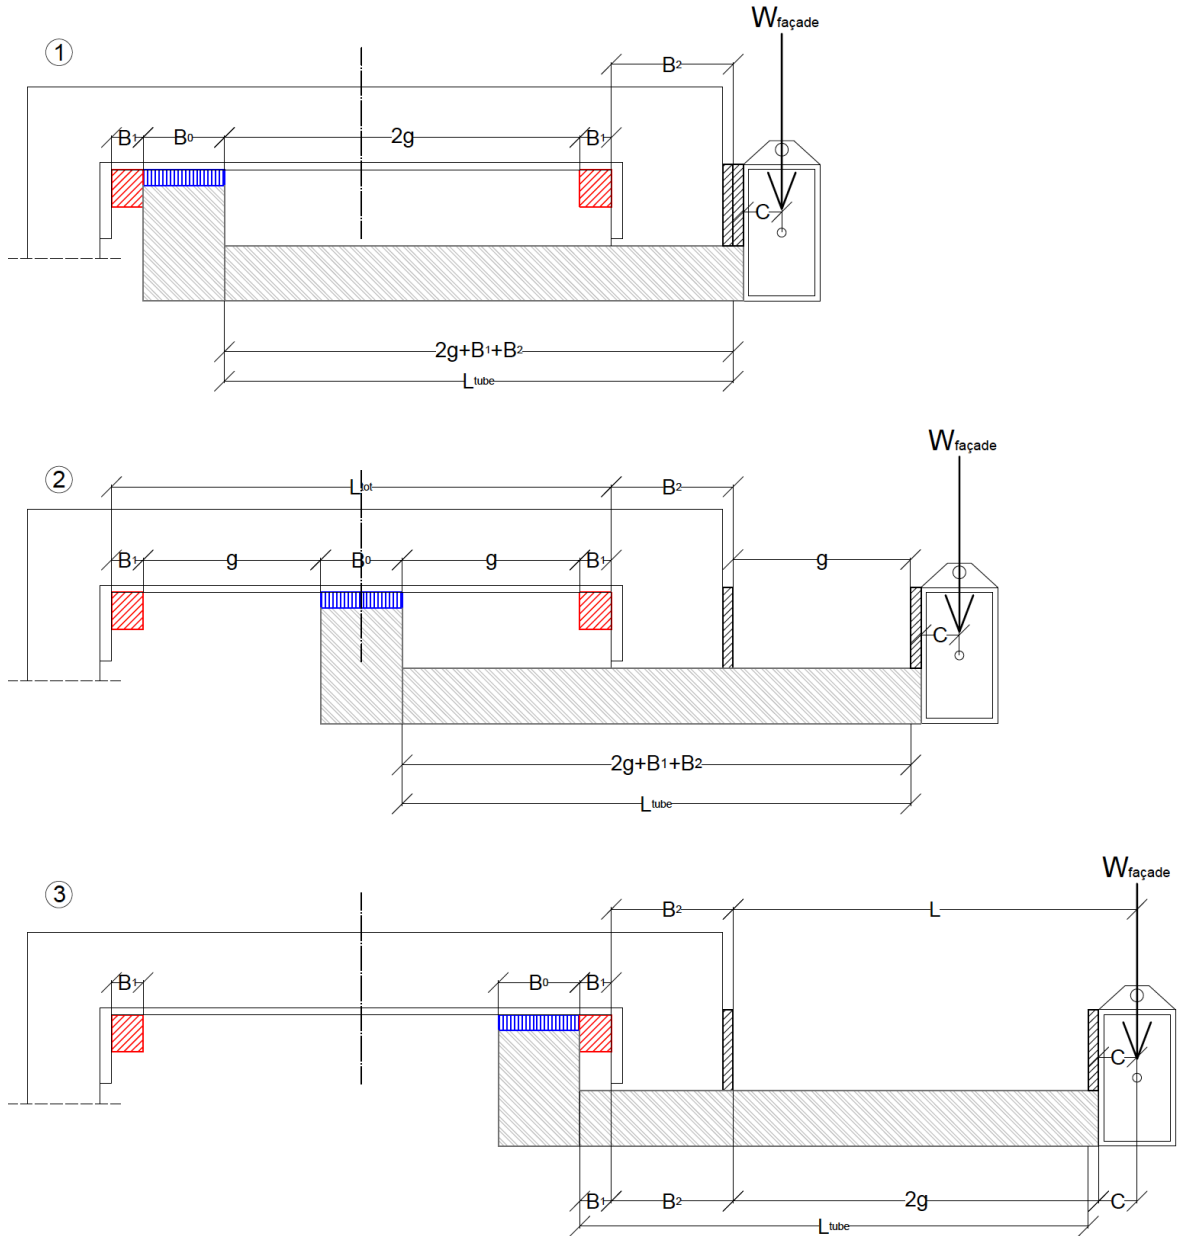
Pre-sizing sketches of the sliding connector in the three main design layouts: 1) closed façade, 2) partially open/closed façade and 3) open façade
